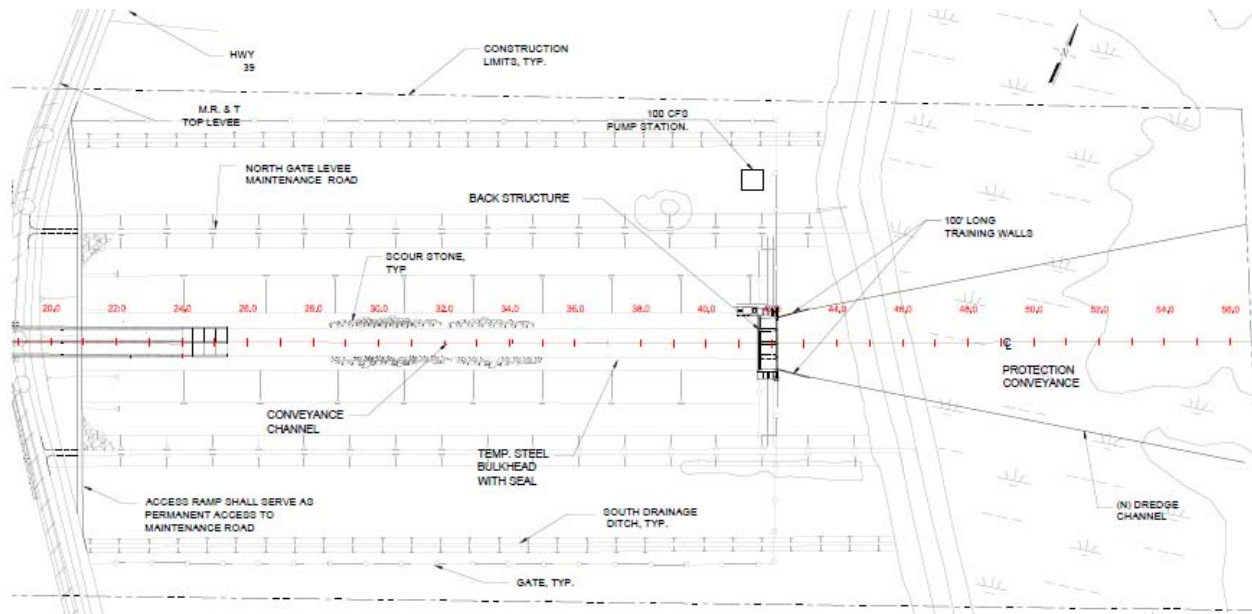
Alt. B – Plan View of the Back Structure and Outlet/Discharge Channel
